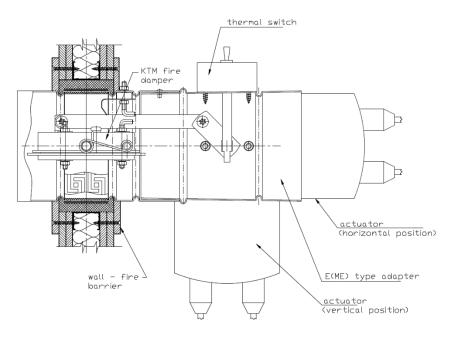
Installation of KTM-E(ME) fire damper in light fire barrier
